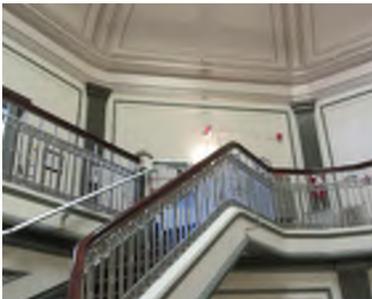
Rotunda Stair Guardrail Height
